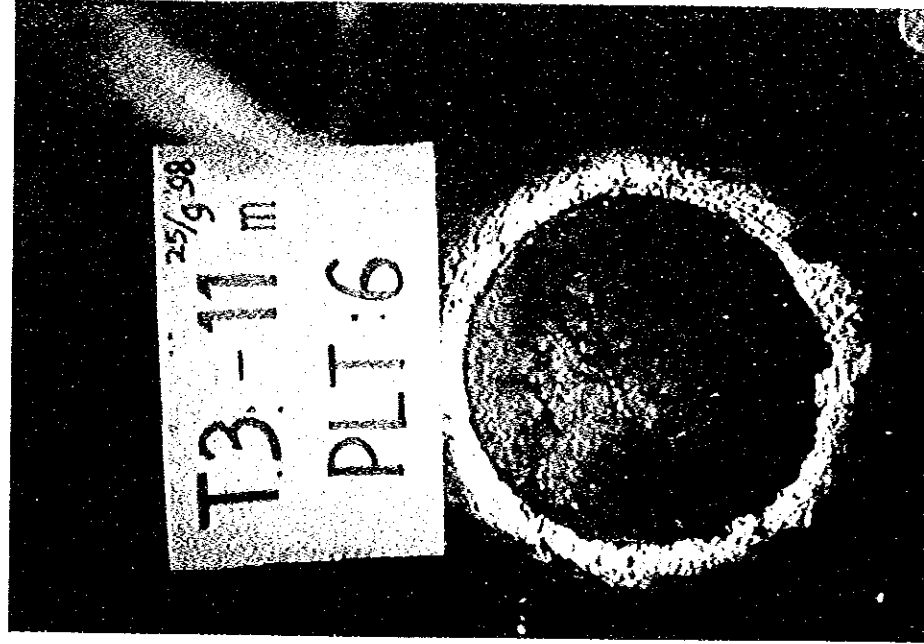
Tested Rock Surface Photograph for In-Situ Plate Loading
